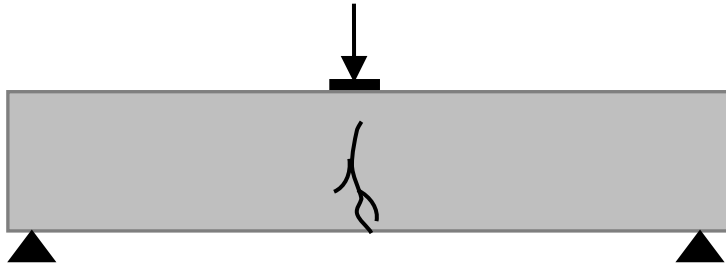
Flexural failure mode of concrete beam.
